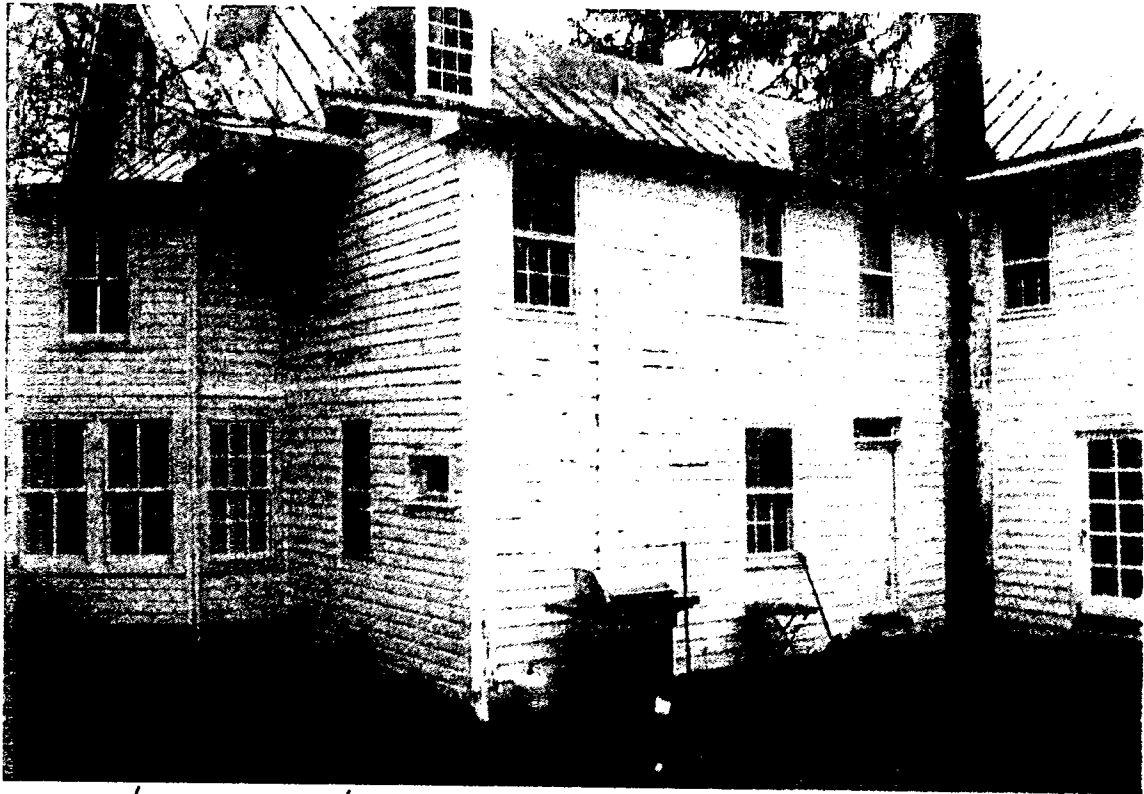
DETAIL: NOTE OF FACE OF THIS ELEVATION - 6" CLAPBOARD SIDING BUTTS AGAINST 6" GERMAN SIDING.
